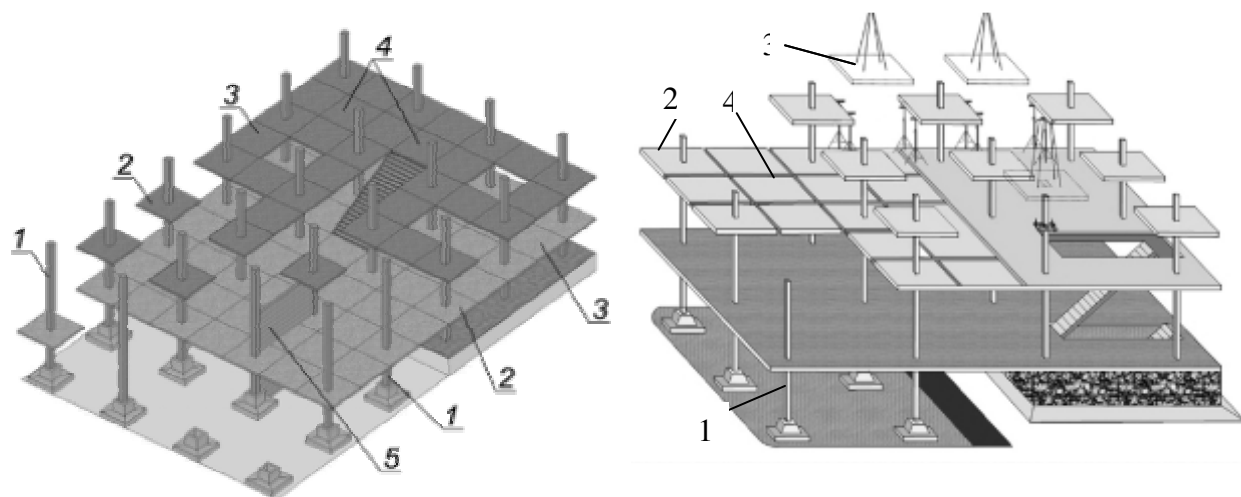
Schemes of uncapital ungirder frame structure in residential building:
